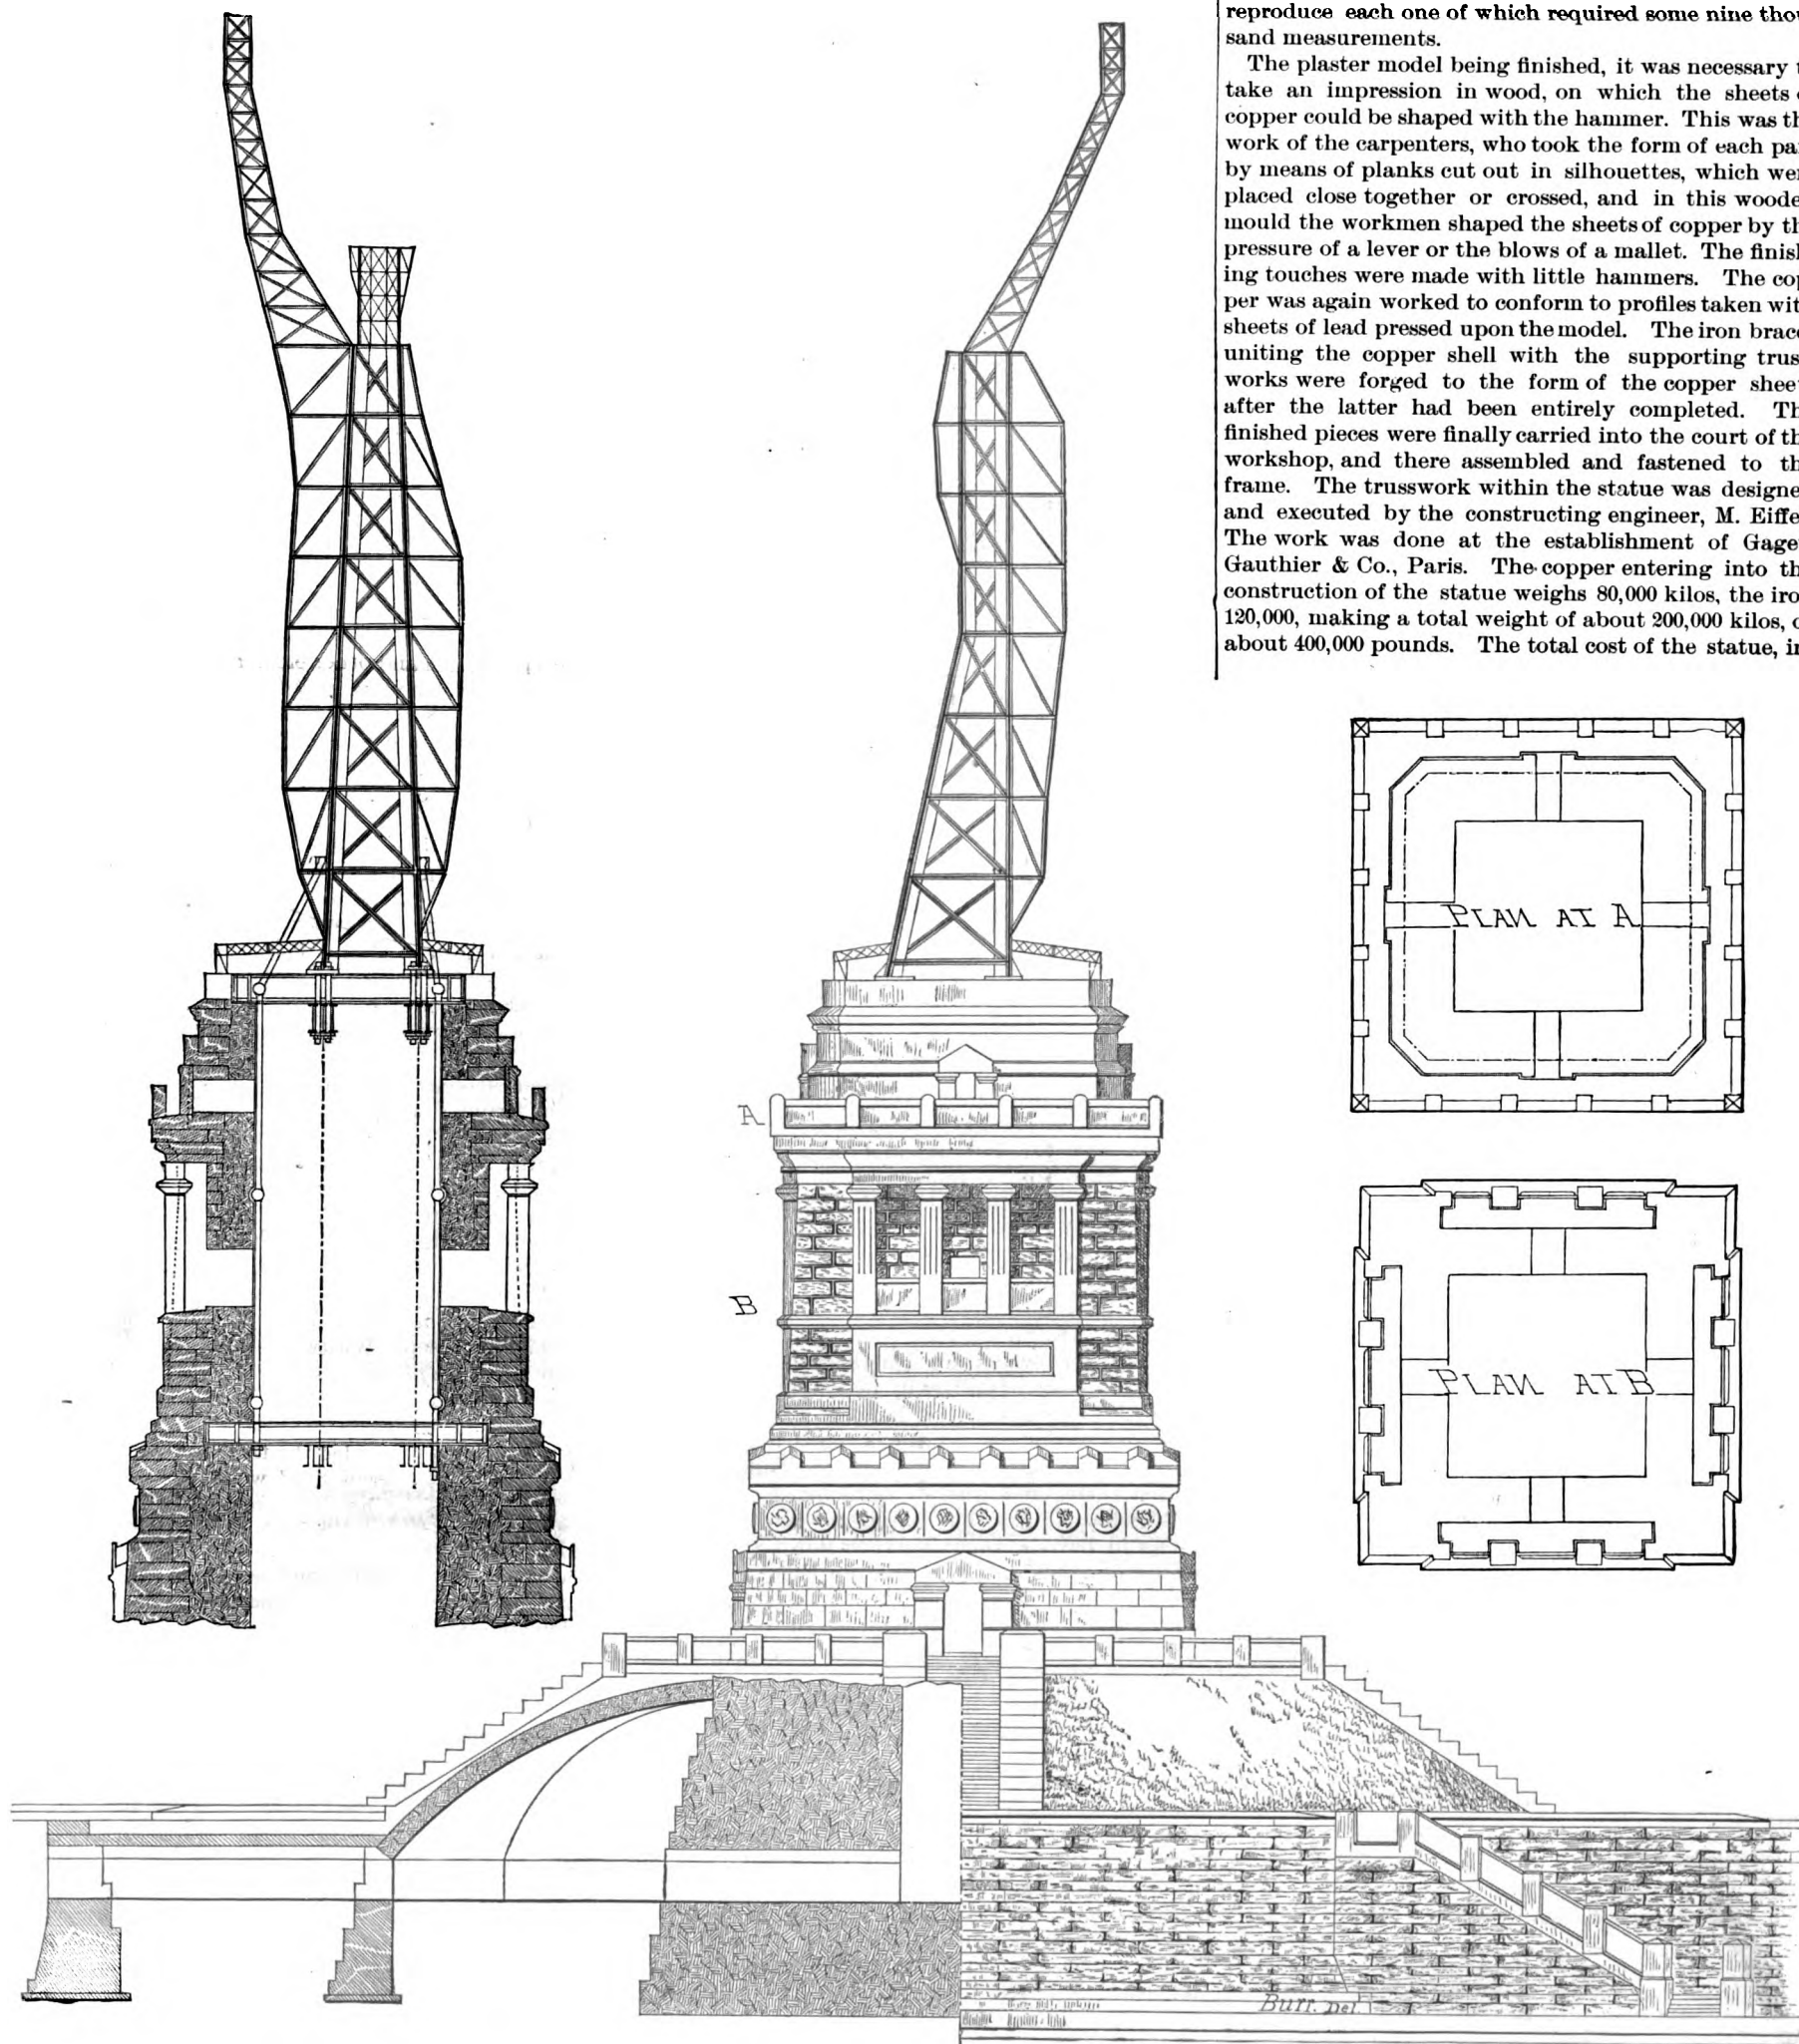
ELEVATION, PLANS, AND SECTIONS OF PEDESTAL, SHOWING METHOD OF ANCHORING THE STATUE.
